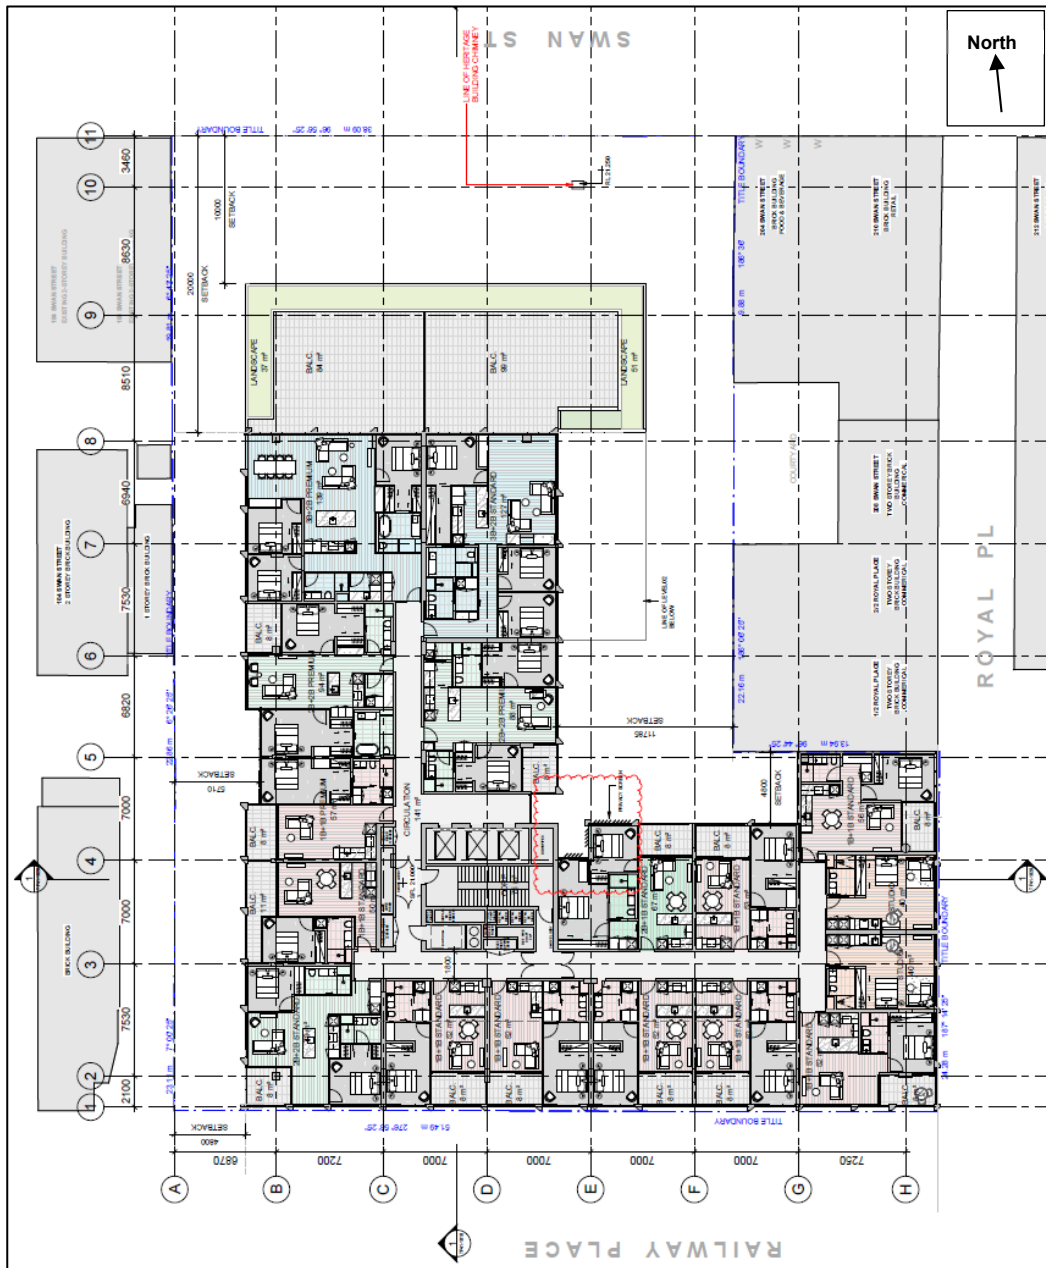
Level 3 floor plan of the proposed 188-202 Swan Street Development.
